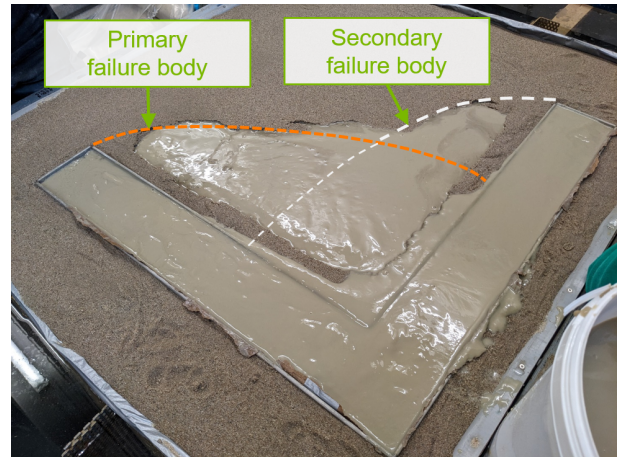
Primary failure and secondary failure of model test “Corner Trench 60 / 60” after exceeding the ultimate limit
